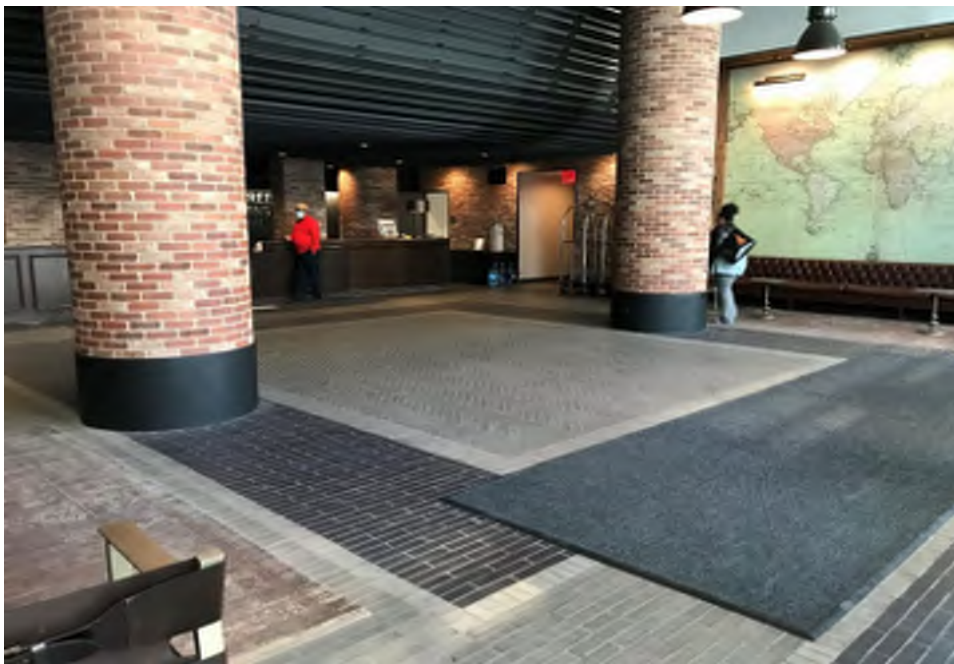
First floor concrete slab covered in tile flooring within the commercial space, facing northwest. 30 March 2021.
